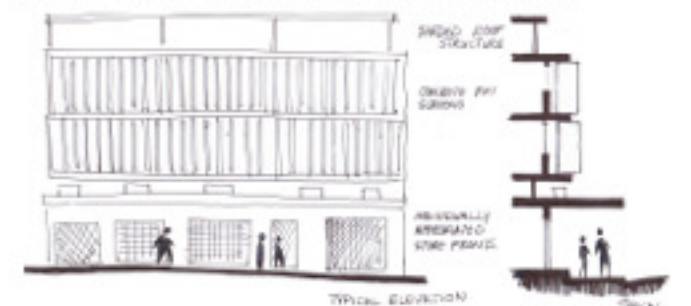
Sketch showing typical shaded facades and roof terrace
